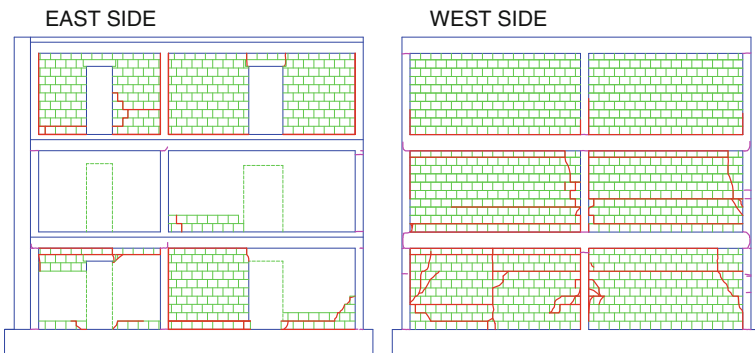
Damage of masonry infills after Test #3 ($PGA = 0.54g$)
